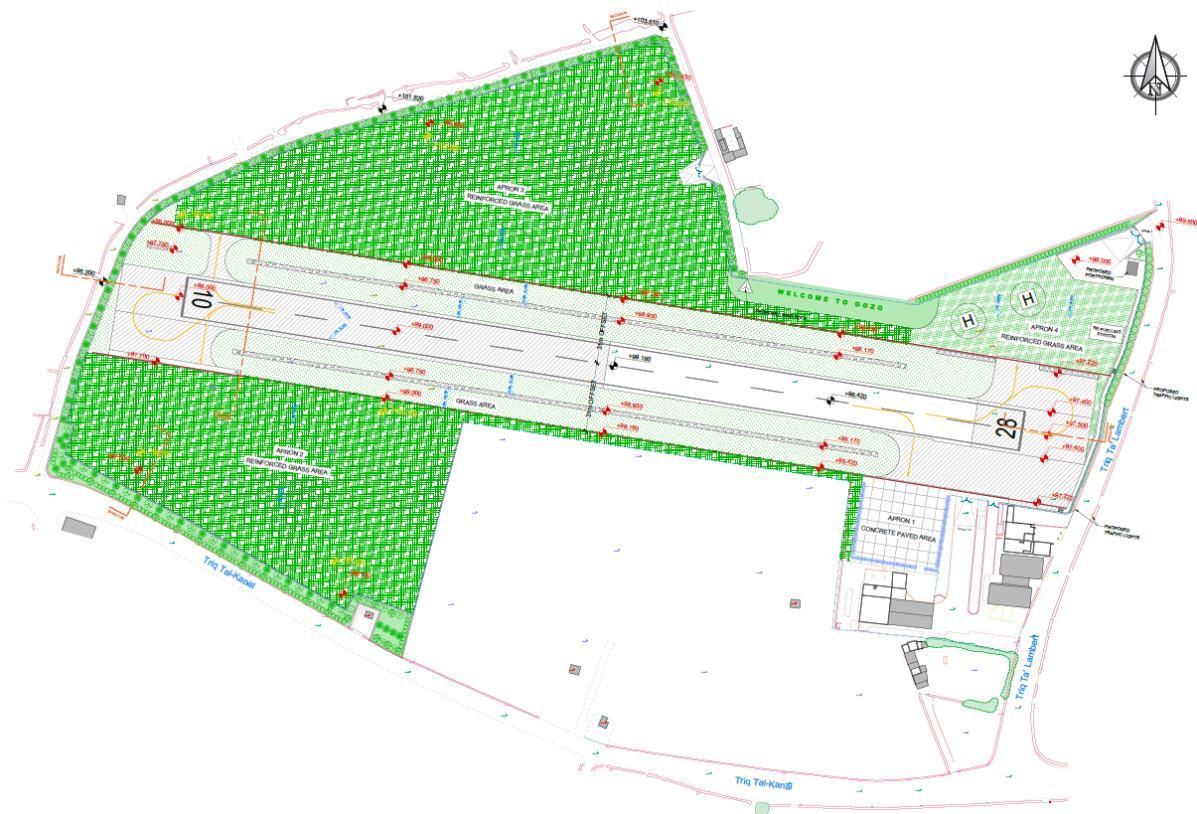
Proposed Block Plan (Source: PDS at Doc PA/07333/22/1h).
